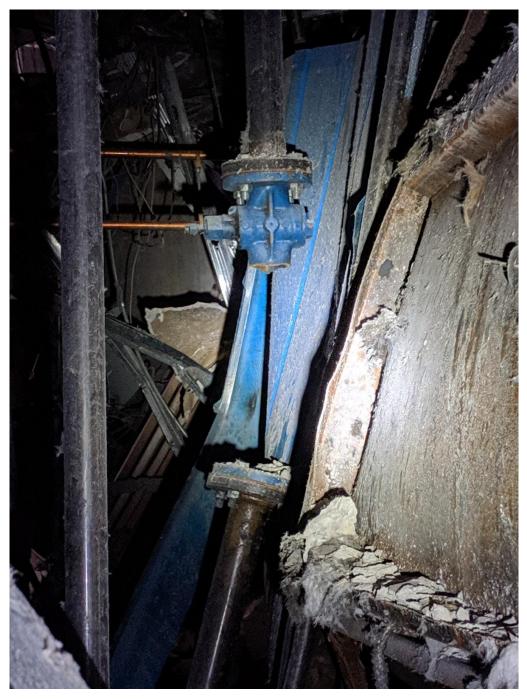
A front view of Boiler #1, showing damage from internal explosion of the furnace assembly.
